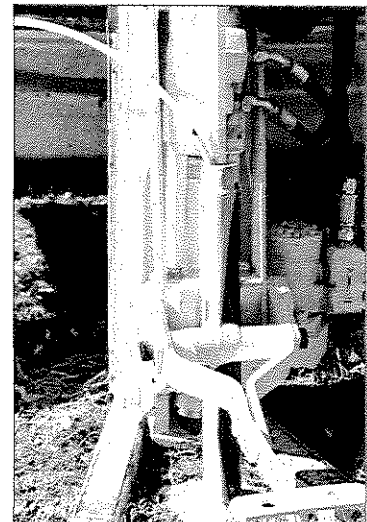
A grout machine and flexible tubing allow bottom-up grouting as the outer casing is retrieved.
